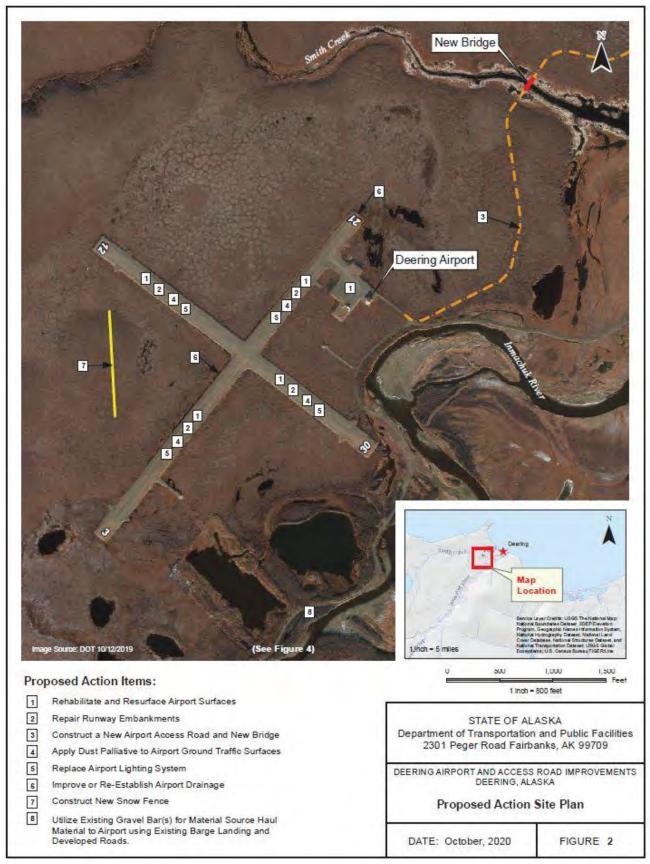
Detail of the proposed airport and access road improvements, including the new Smith Creek bridge near Deering, Alaska.
